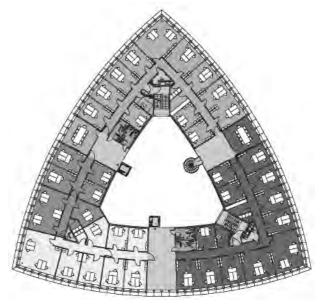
Passive house Energon Ulm 2002 horizontal plan [17]
